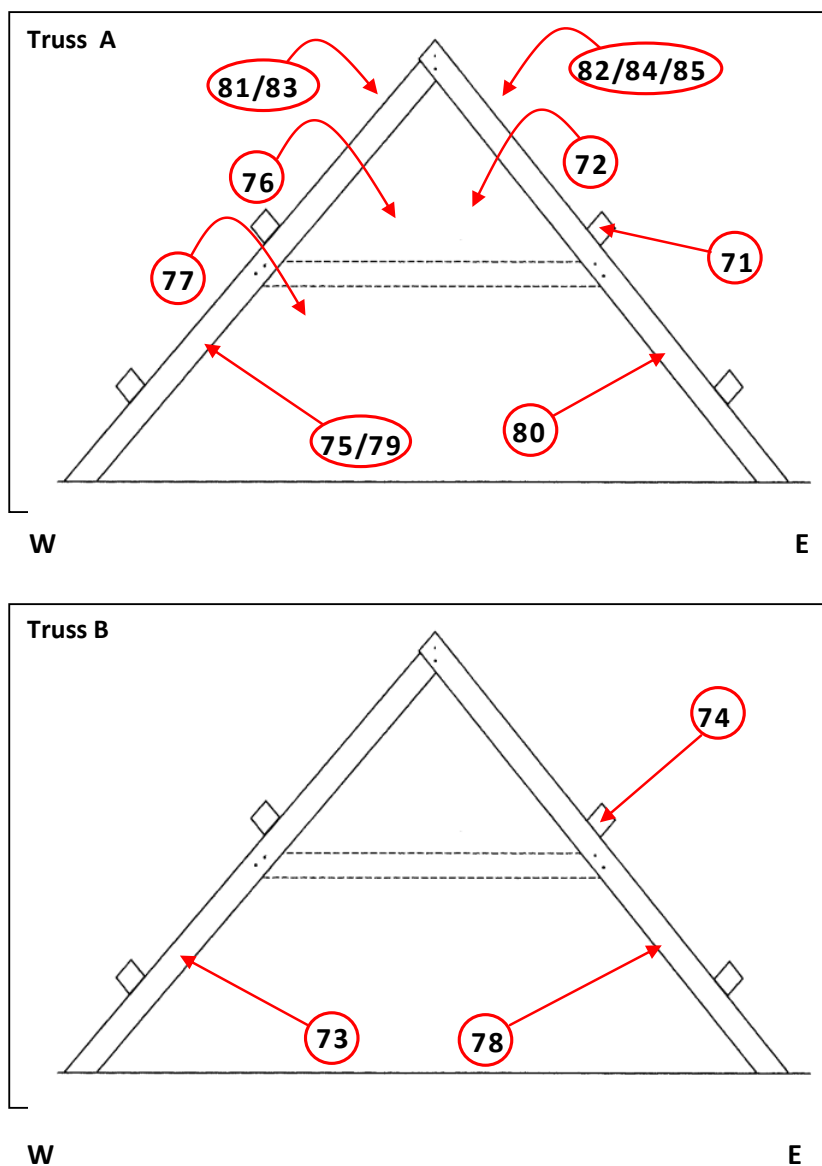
9a The Close (roof 2); trusses A and B showing sample locations (viewed from the south looking north)
